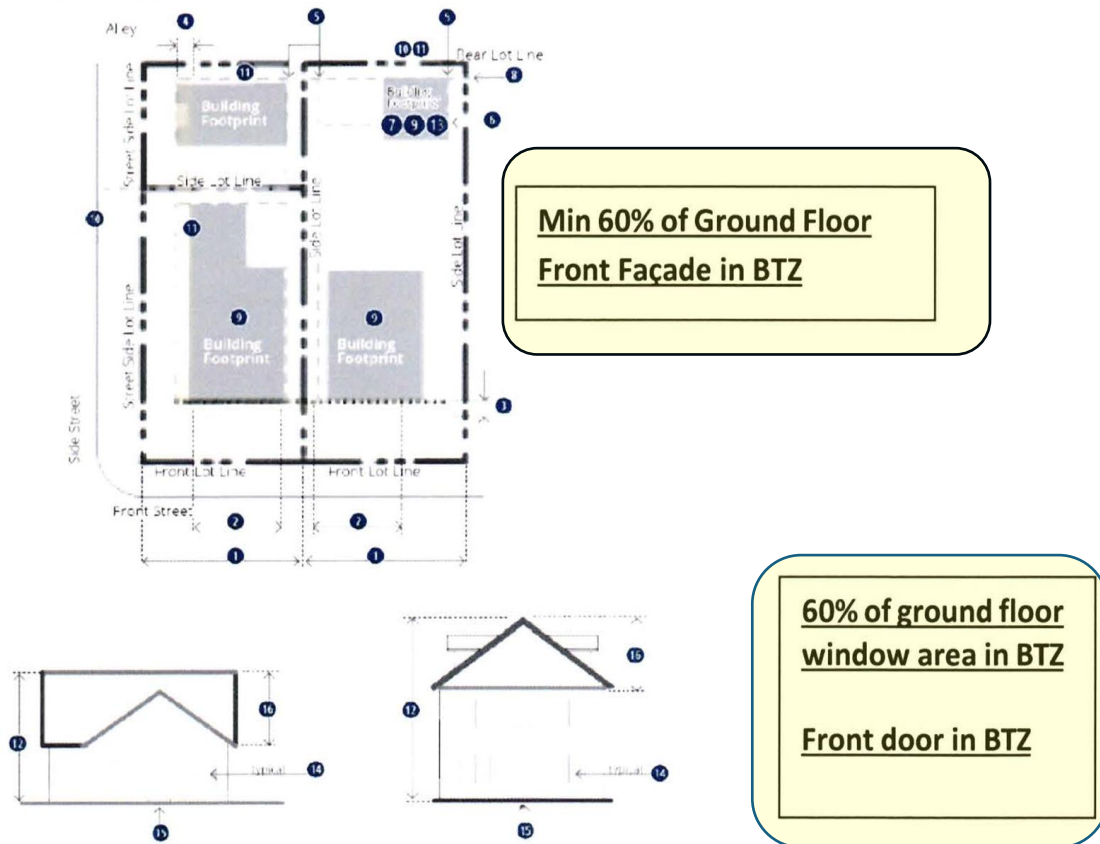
(5). N1 district diagrammatic plans and elevations.
